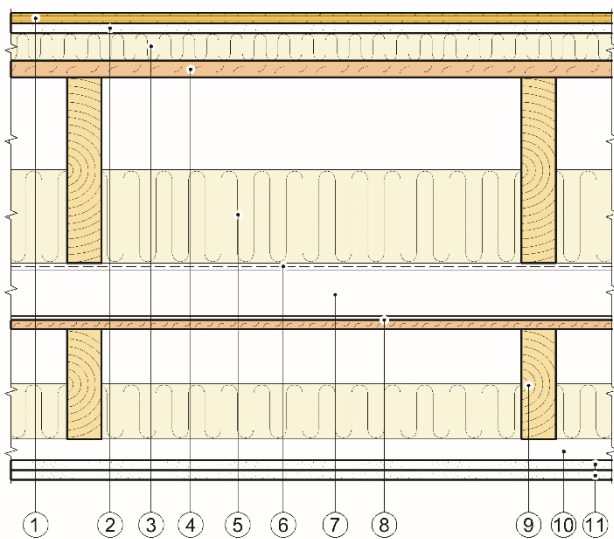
shows principle design of flooring above foundation. The floors are normally delivered to the building site with joists, floor sheathing (subfloor), insulation, windbarrier film if required and windbarrier boards. While further completion is carried out on the building site. The load bearing frame are of structural timber, gluelam, I-joist or LVL according to static and U-value calculations.
